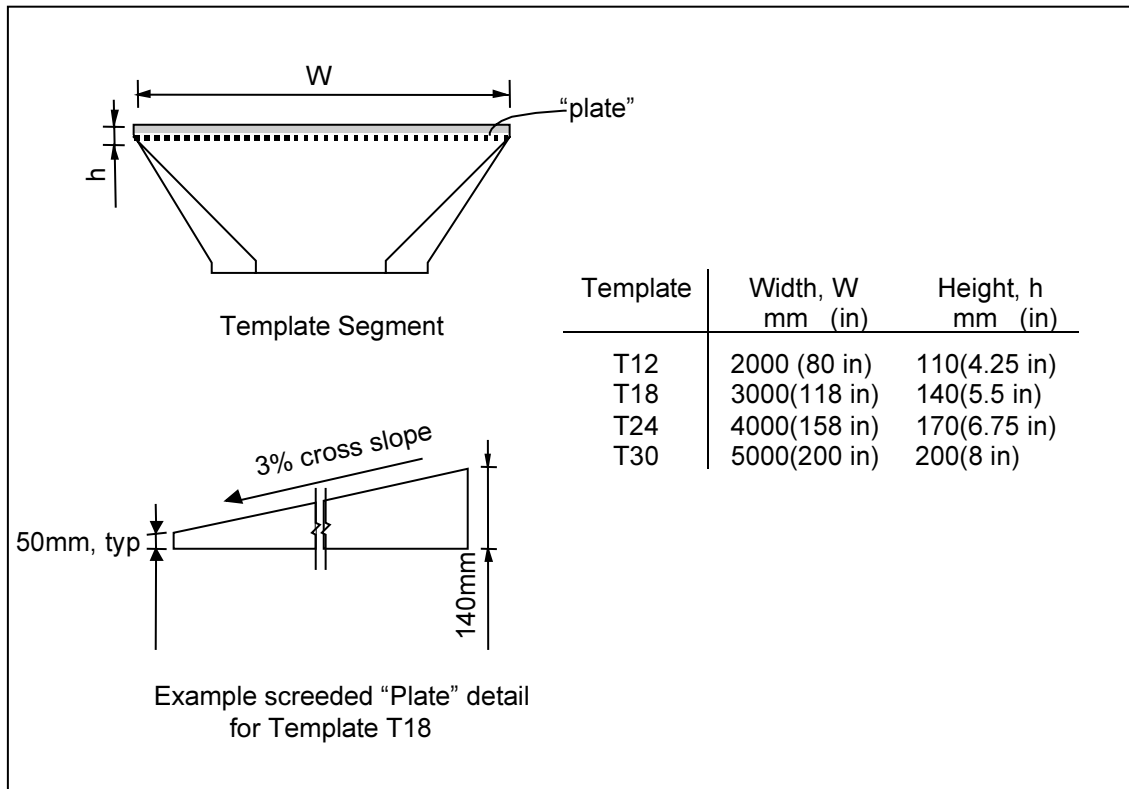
Example of a 3% cap cross-slope being provided for in a precast template
